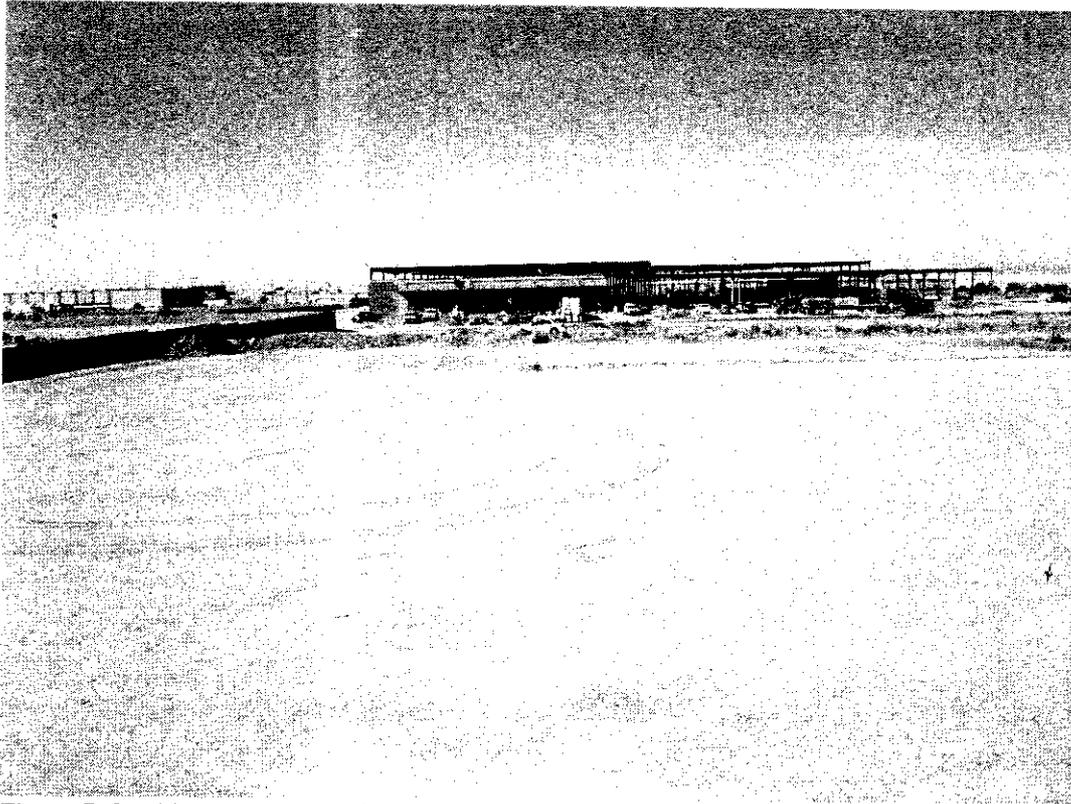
Looking northwest from Tracts B-2 & B-3
